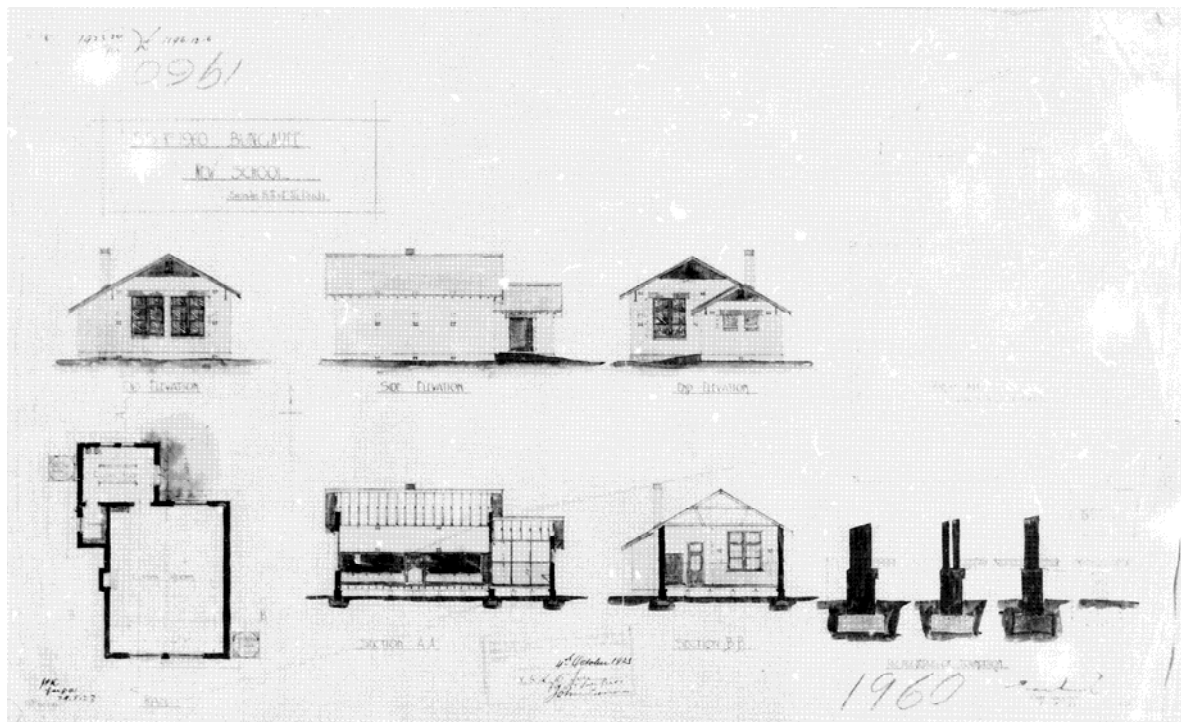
'SS No. 1960 Bungaree New School', plan, elevations, sections, 4 October 1923.
